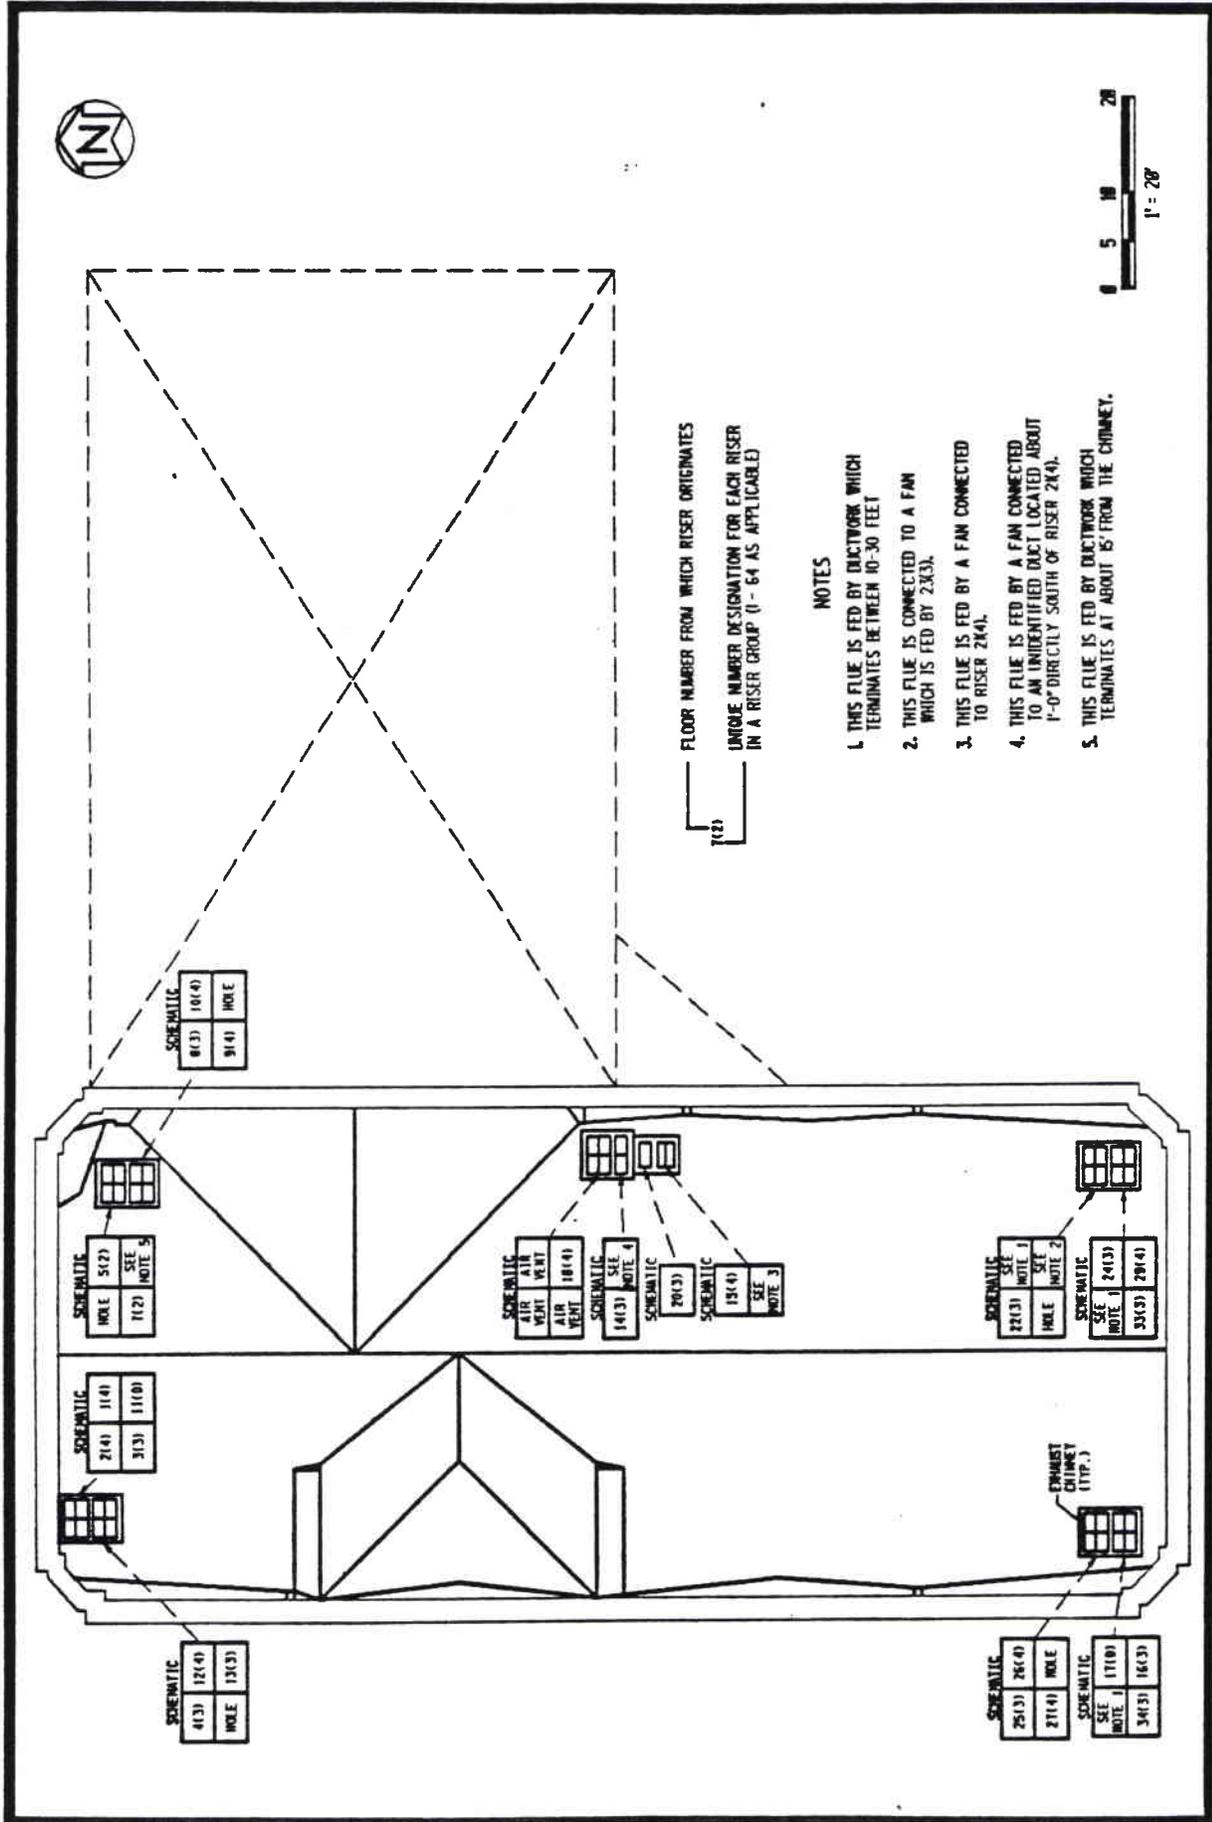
PLAN OF THE LABORATORY ROOF
